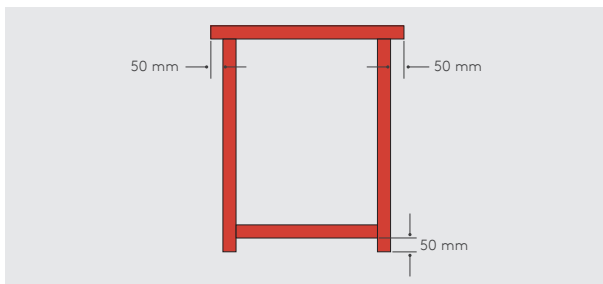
Kingspan Kooltherm® Cavity Closer Sill, Jamb & Head Sections
